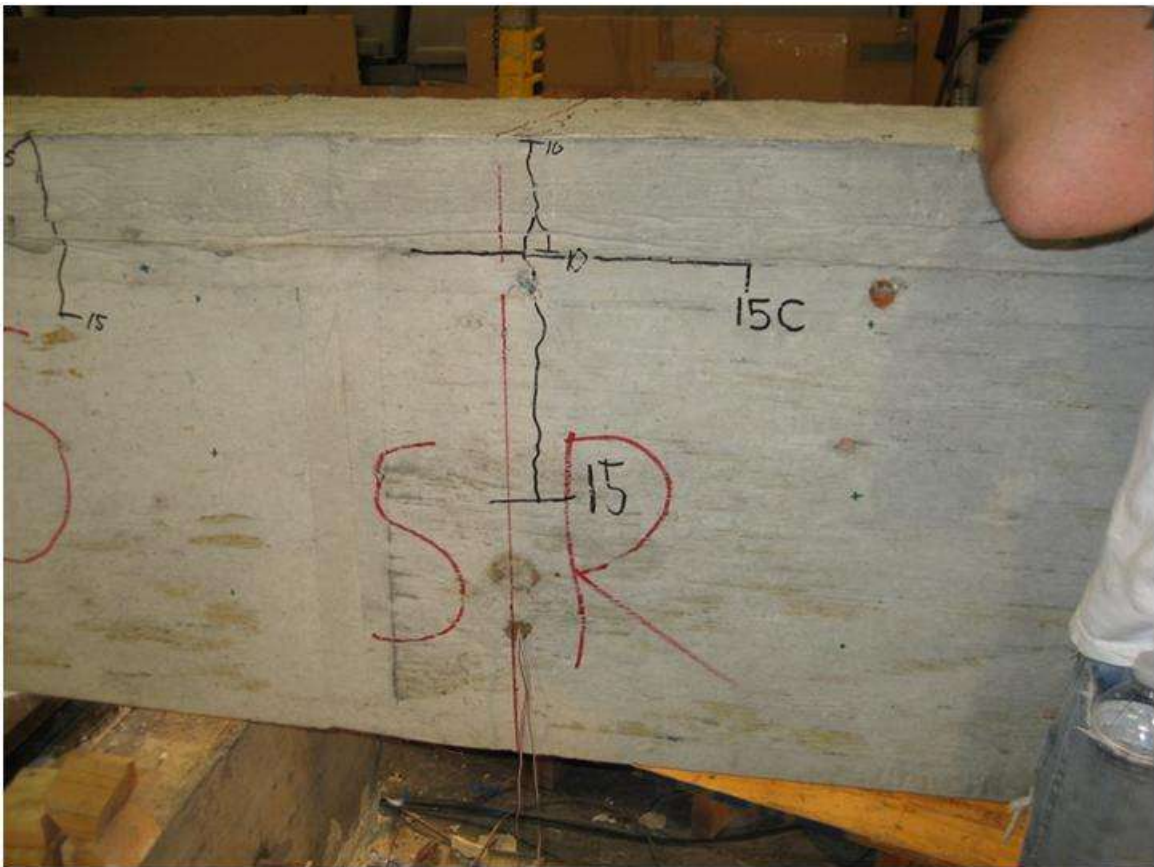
Beam 5, northeast splice region with horizontal crack, 15 kip end load.
